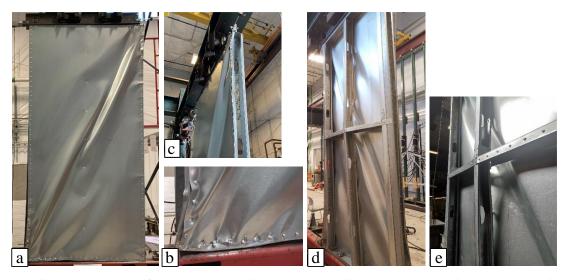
Failure phenomenon of Group 3 shear walls, (a) Sheet buckling at about peak point; (b) Sheet tearing; (c) Buckling on boundary studs; (d) Buckling on interior stud; (e) Screws pulling-out
